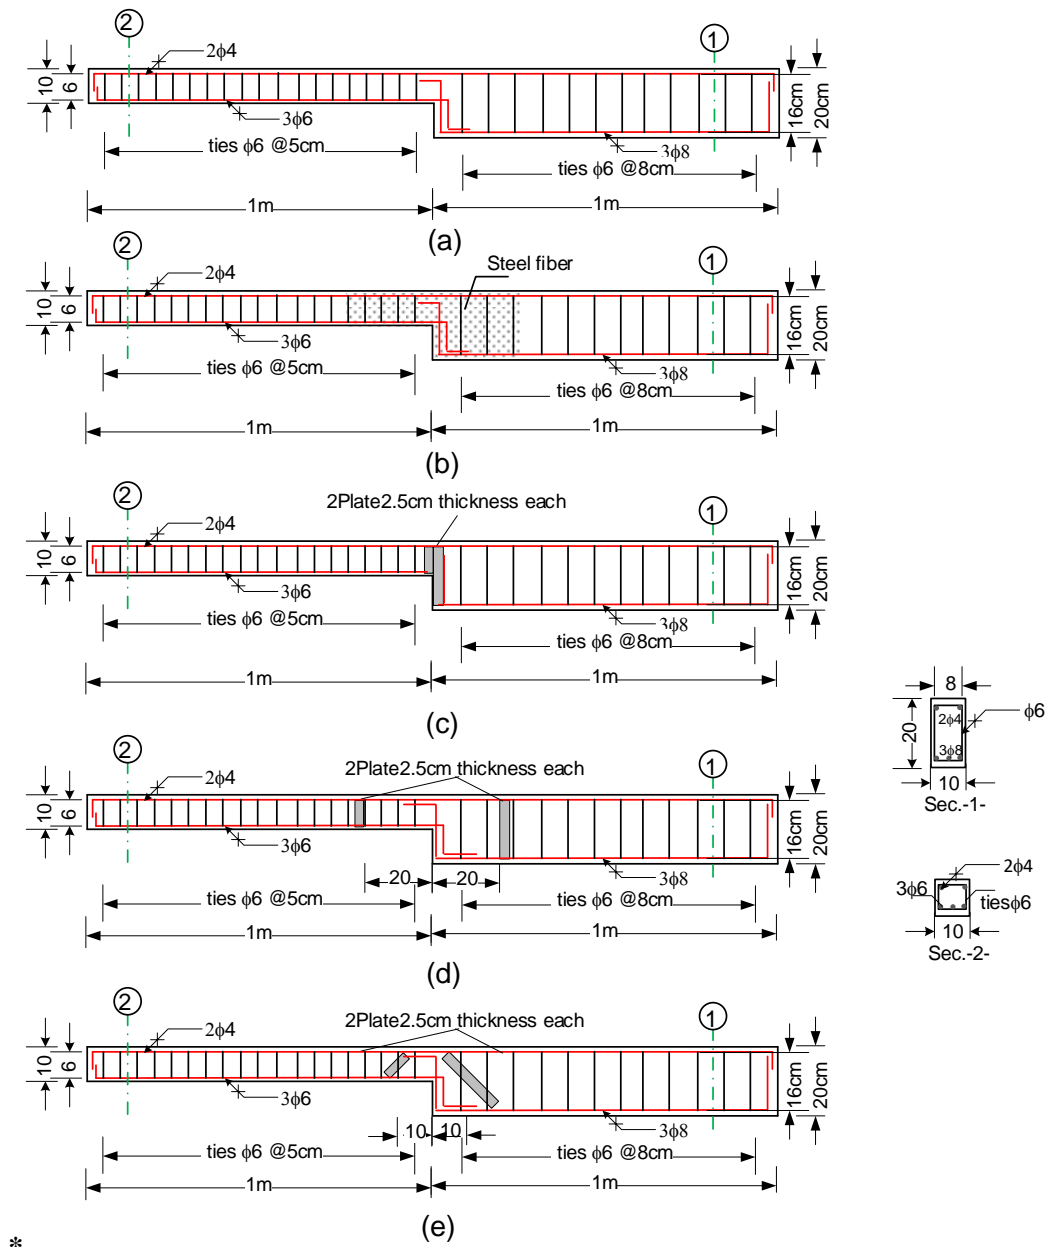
Dimensions and reinforcement details of the simply supported beams (all dimension is in cm)
